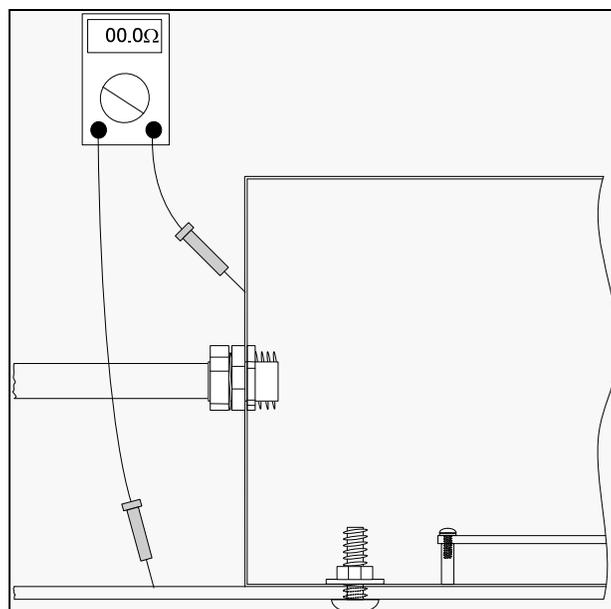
Continuity Testing – Mounting Surface to Enclosure
